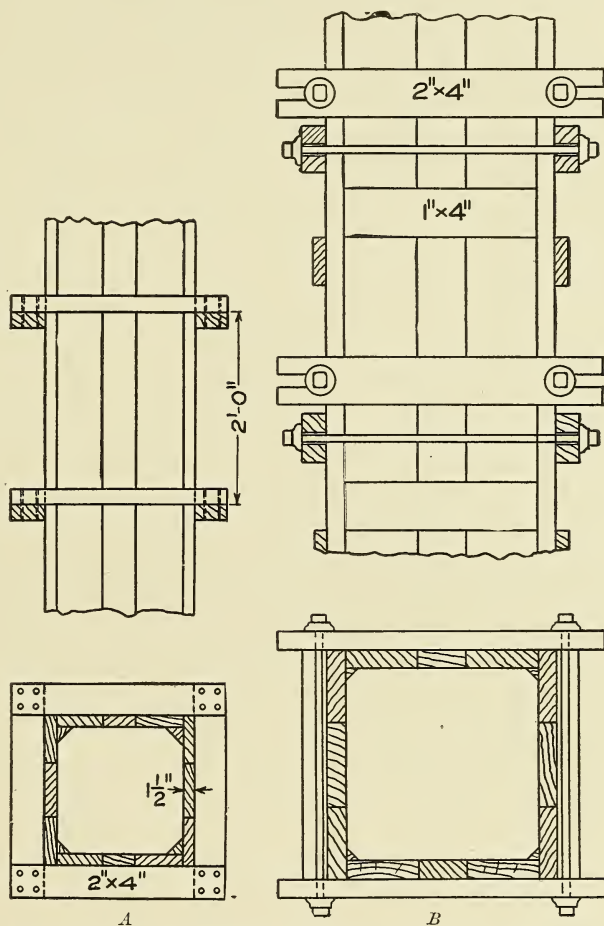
Forms for Columns. *A*—Common method of construction; *B*—Method used in constructing Harvard Stadium.
